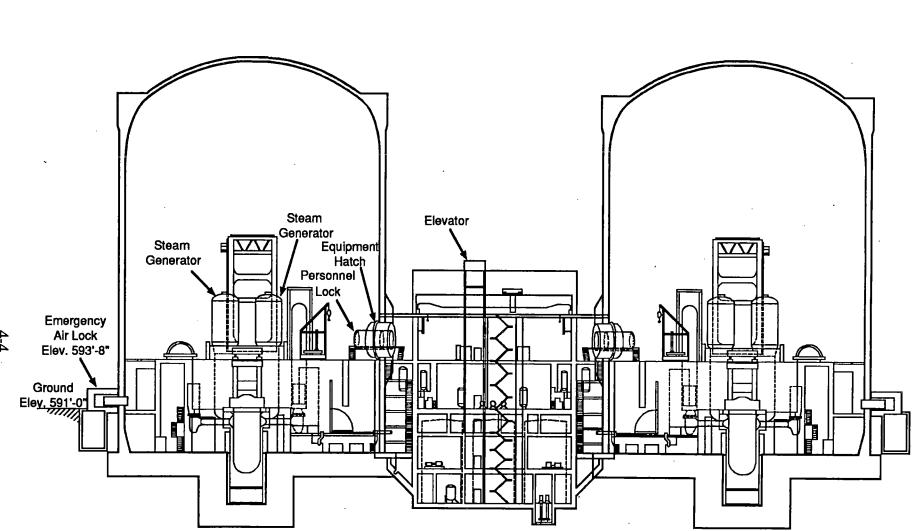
Zion 1 and 2 Section Drawings (Page 1 of 2)
